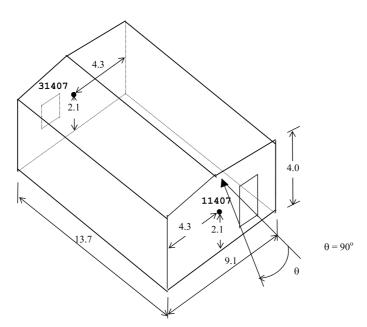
13.7×9.1×4.0 m full scale test building at Texas Tech Tap Locations • All dimensions in m
